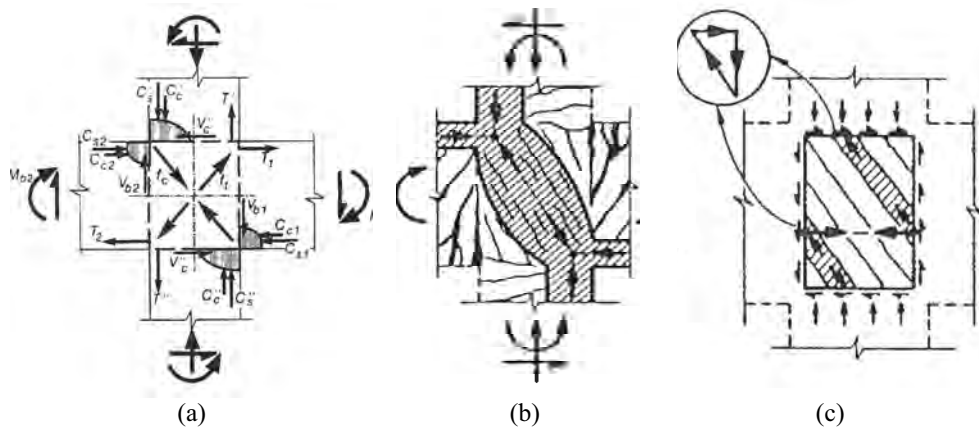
Mechanisms of shear transfer at an interior beam-column joint: (a) Force from beam and columns acting on joint core; (b) Strut-mechanism; (c) Truss-mechanism; (Paulay et al., 1992).
